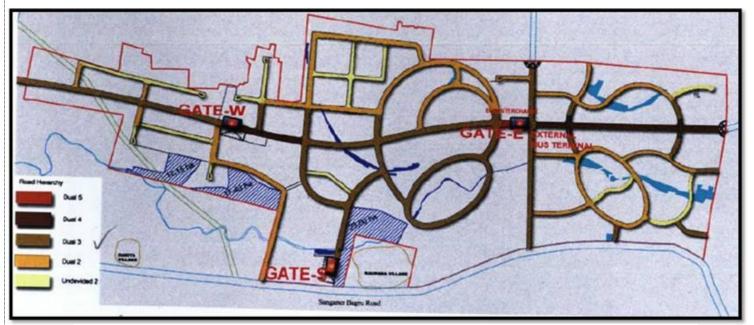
Road Network Plan from Mahindra World City Jaipur, including key exit gates (MWCJ Masterplan 2007)
